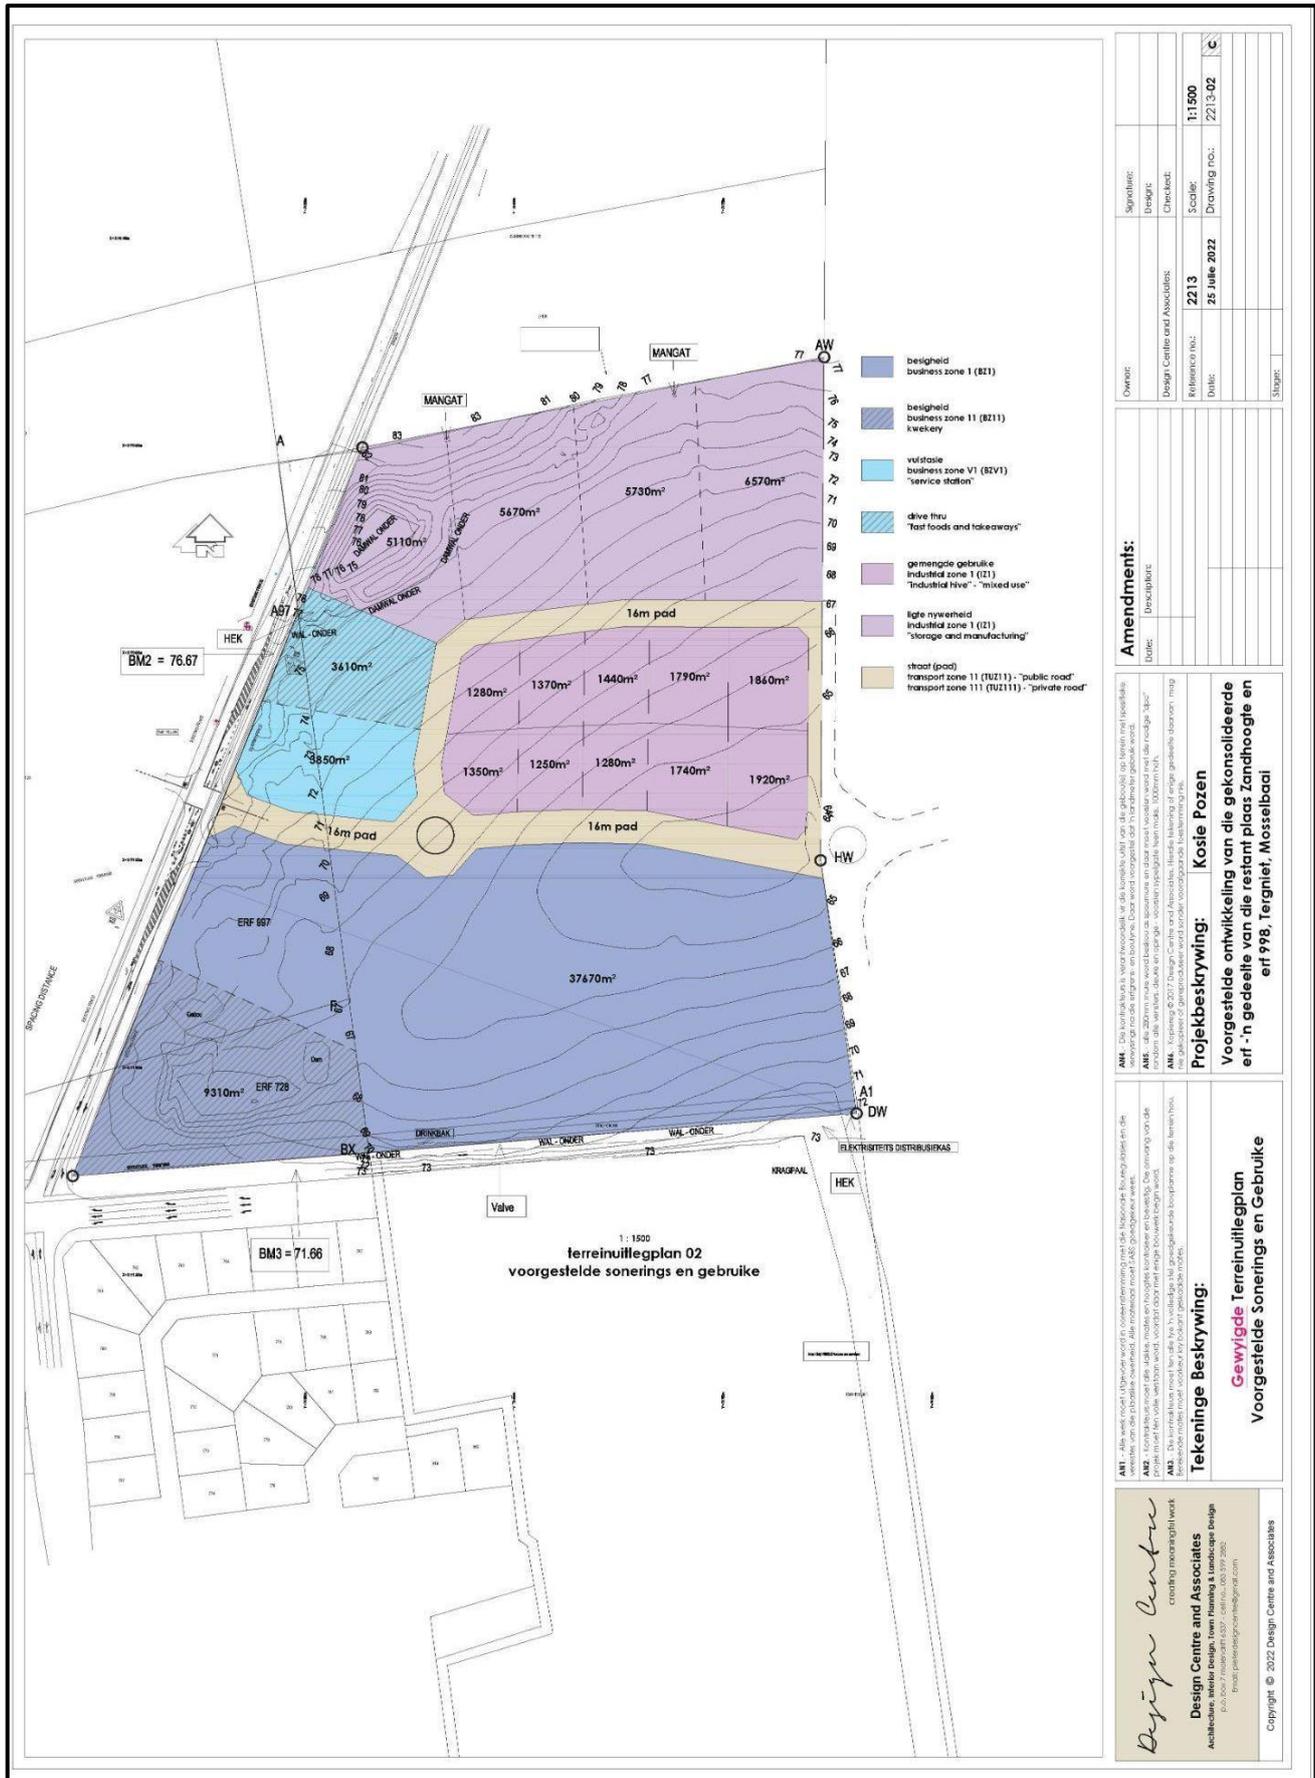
Proposed site development plan (SDP) for the study area under alternative B.
